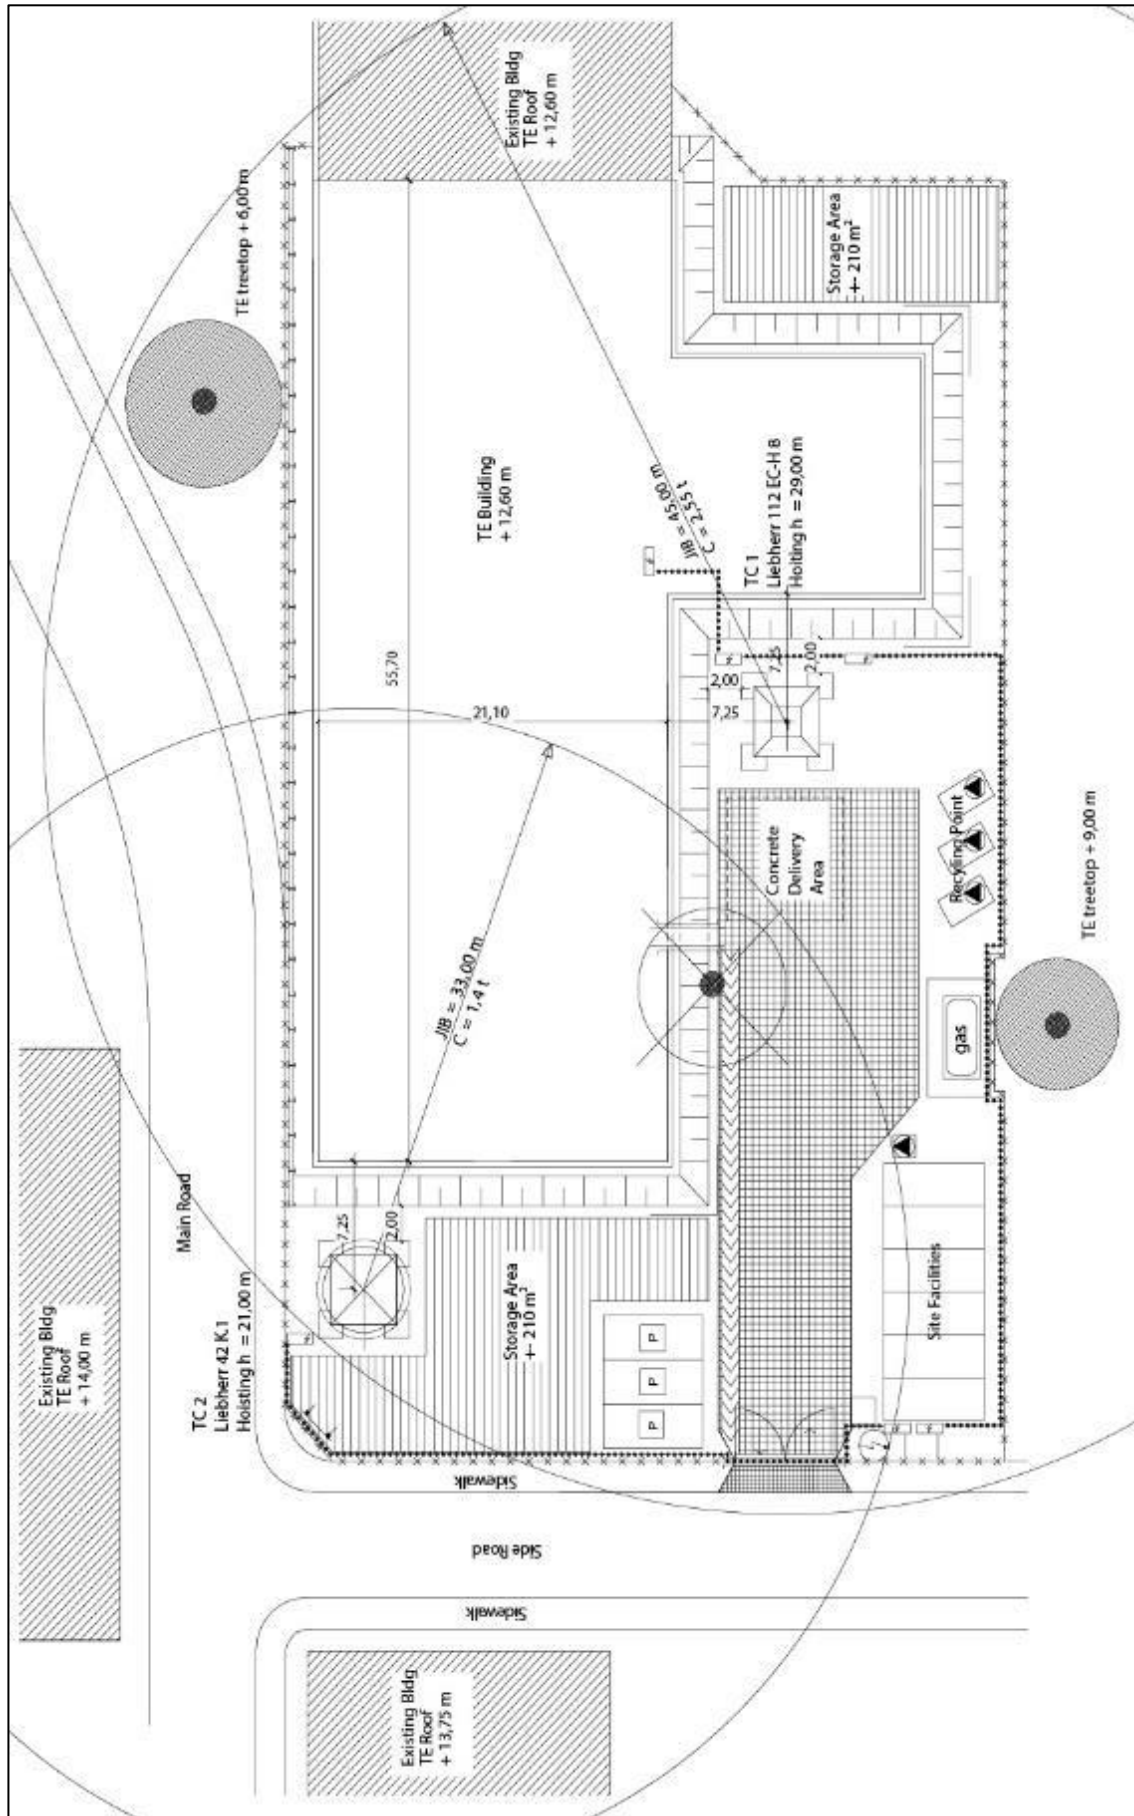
Example of a site installation plan – (adapted from [13], Bild 3.2)
